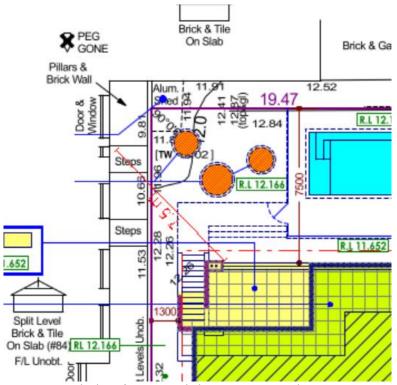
Overlooking from upper balcony to eastern adjoining property to non-habitable rooms at ground level.
